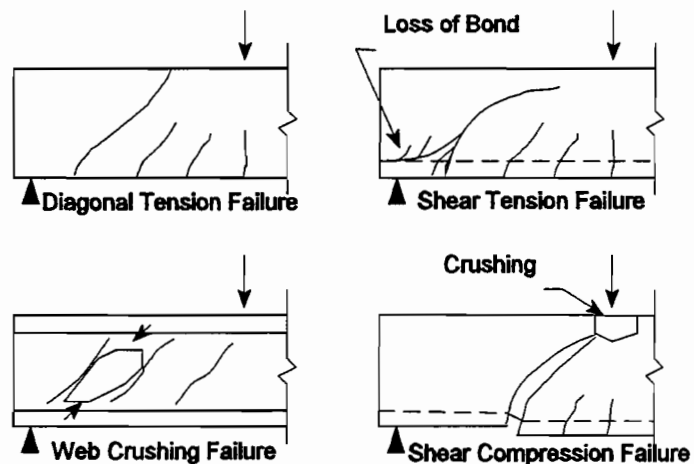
Shear failure modes for prestressed concrete beams.
